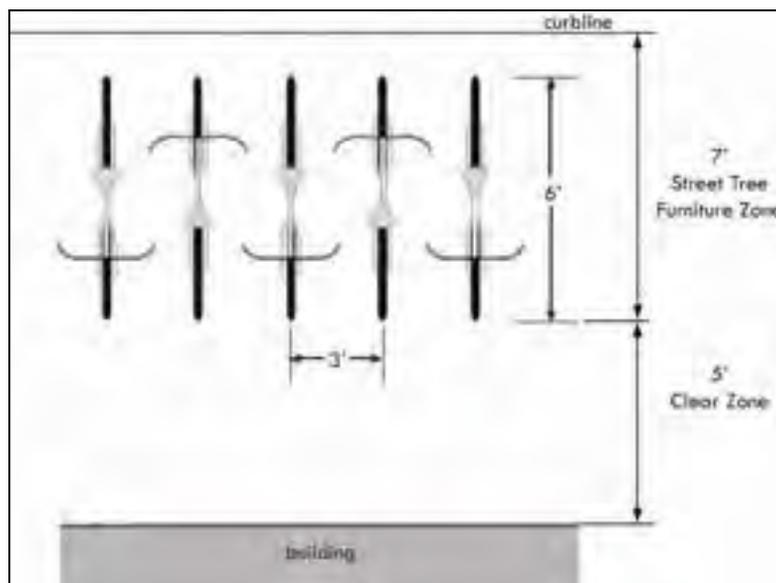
Bicycle parking design – Urban Roadway sidewalk example
